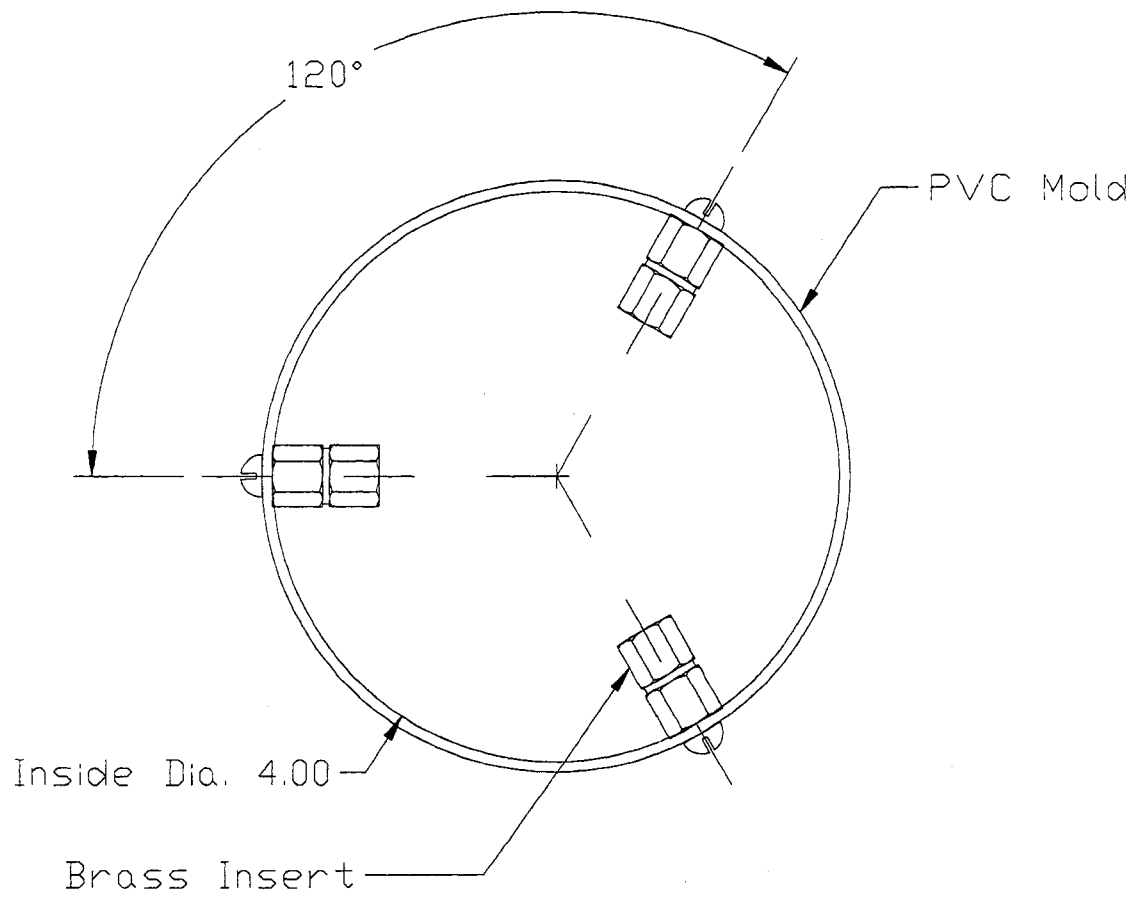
A. Top view of a PVC mold used for casting 4 x 11 in. (100 x 280 mm) creep and shrinkage specimens. Also shown are brass inserts mounted inside the mold prior to casting concrete.
